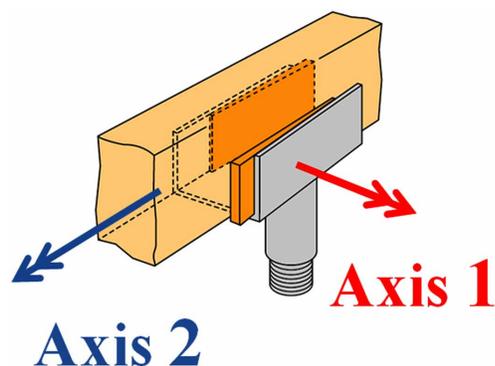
Test setup for the forkhead joint bending tests about axis 2
